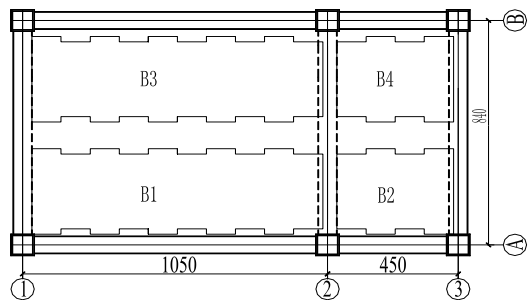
Plan of structural plane layout of precast hollow core diaphragm (Units: mm)
